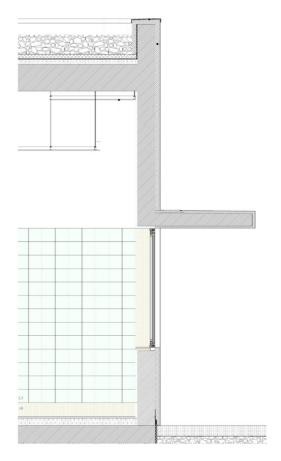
Escola Secundária João Gonçalves Zarco | Façade section
